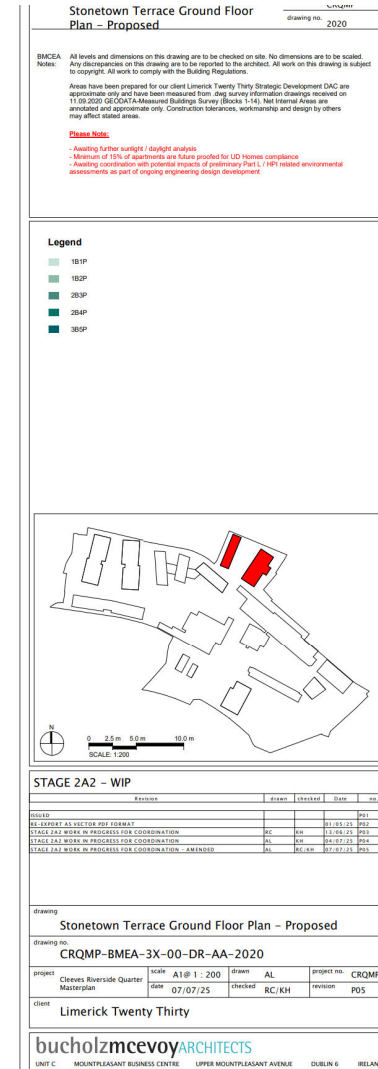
Proposed Layout including Refuse Storage at Stonetown Terrace Zone
